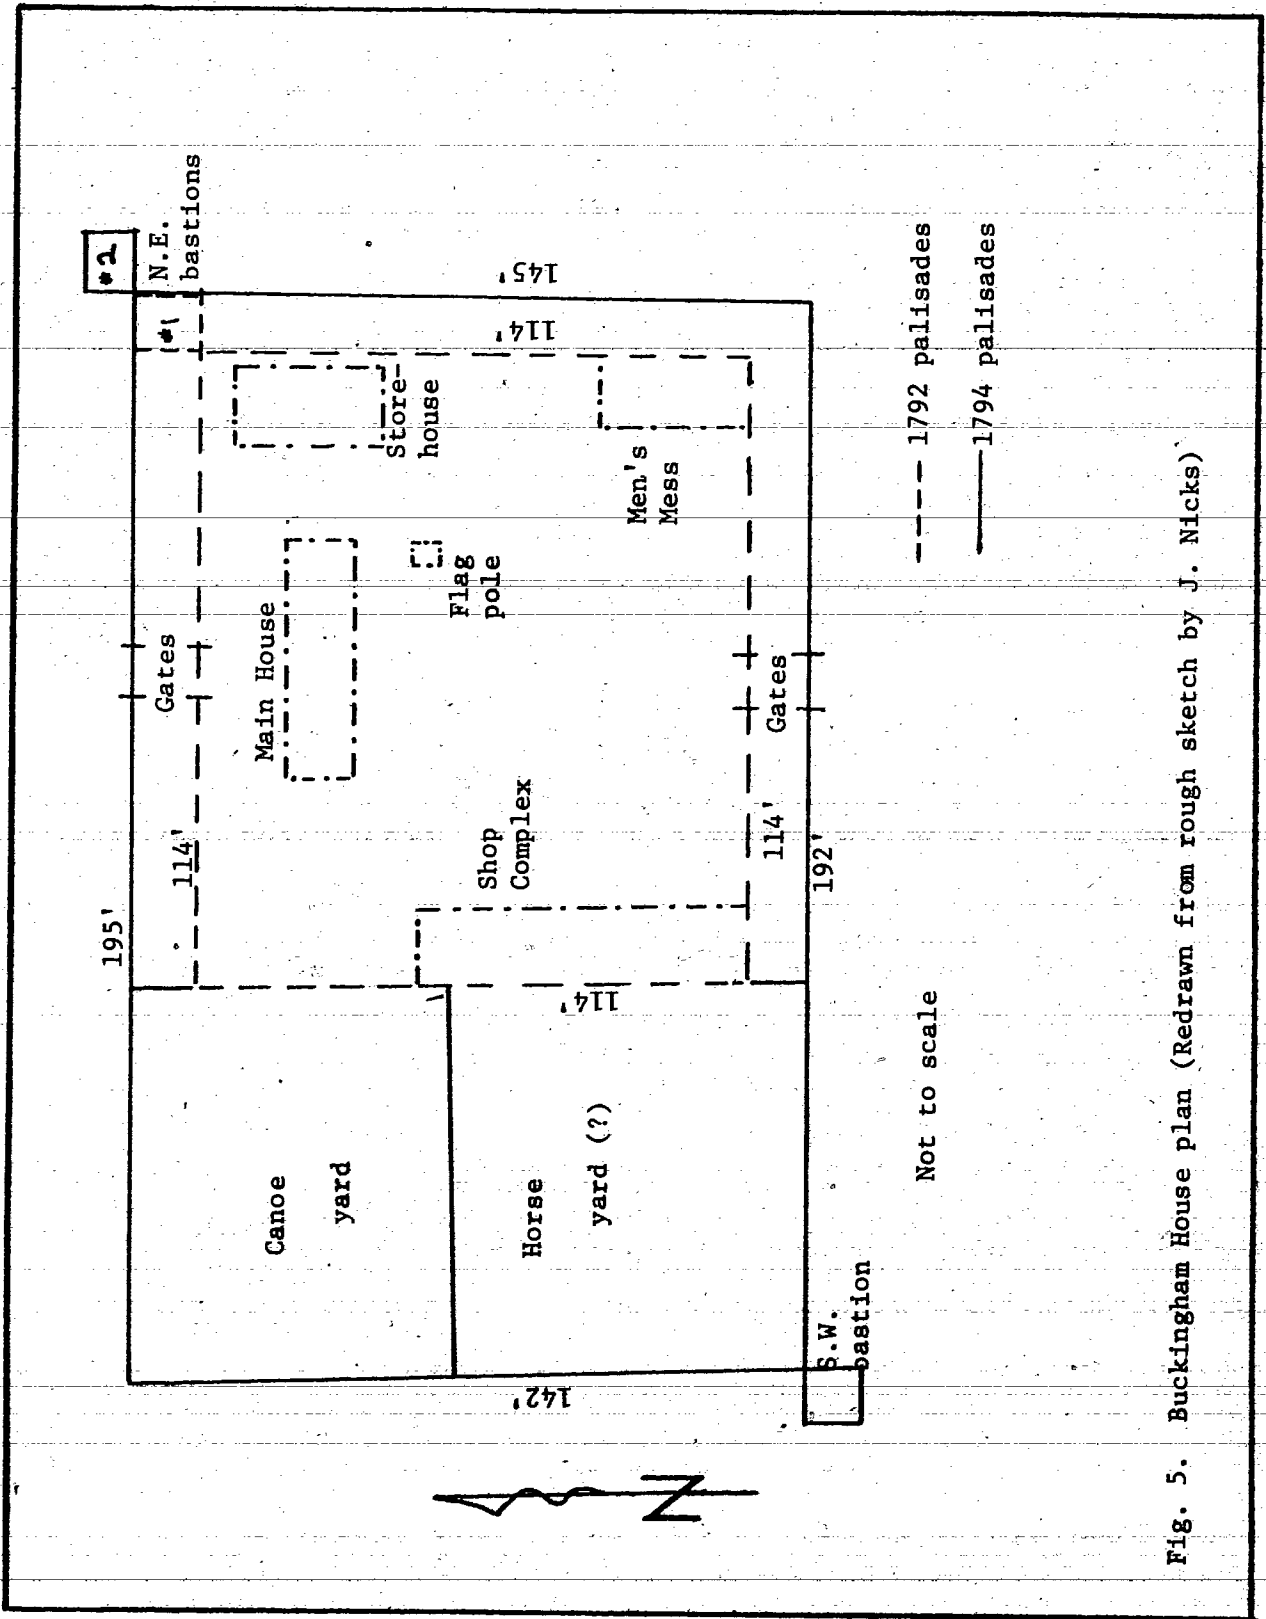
Buckingham House plan (Redrawn from rough sketch by J. Nicks)
